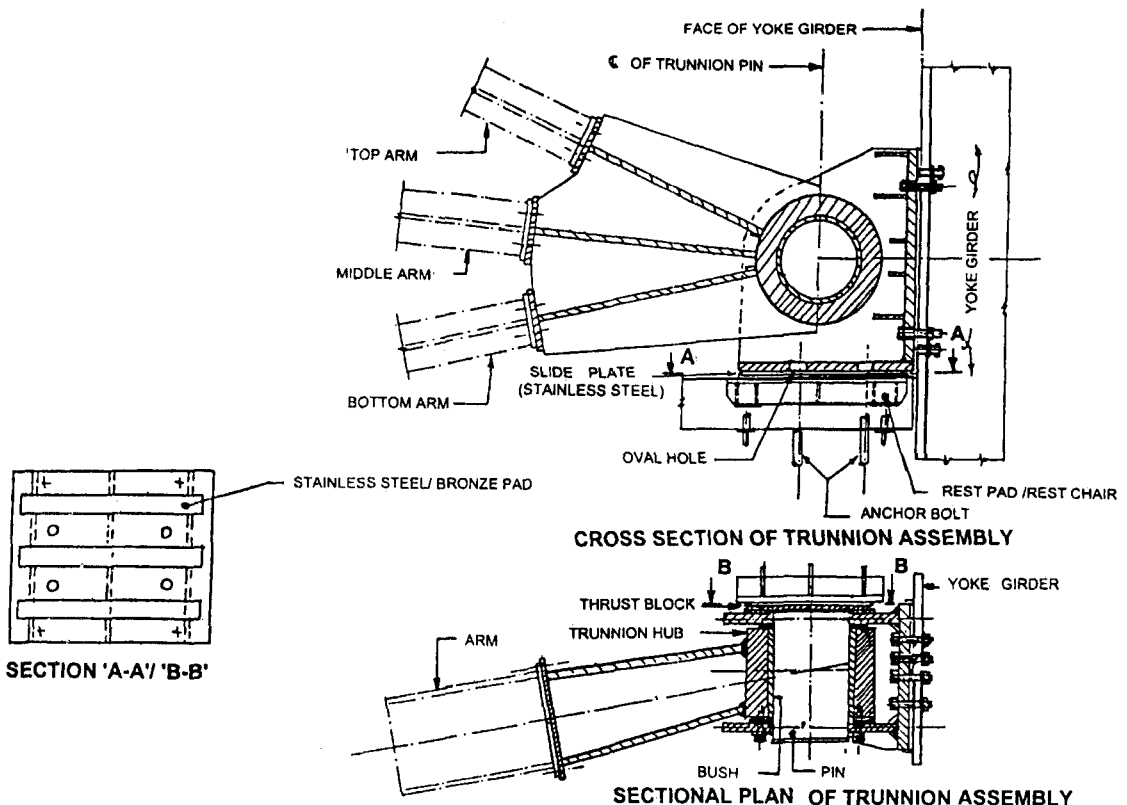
TRUNNION ASSEMBLY ARRANGEMENT
